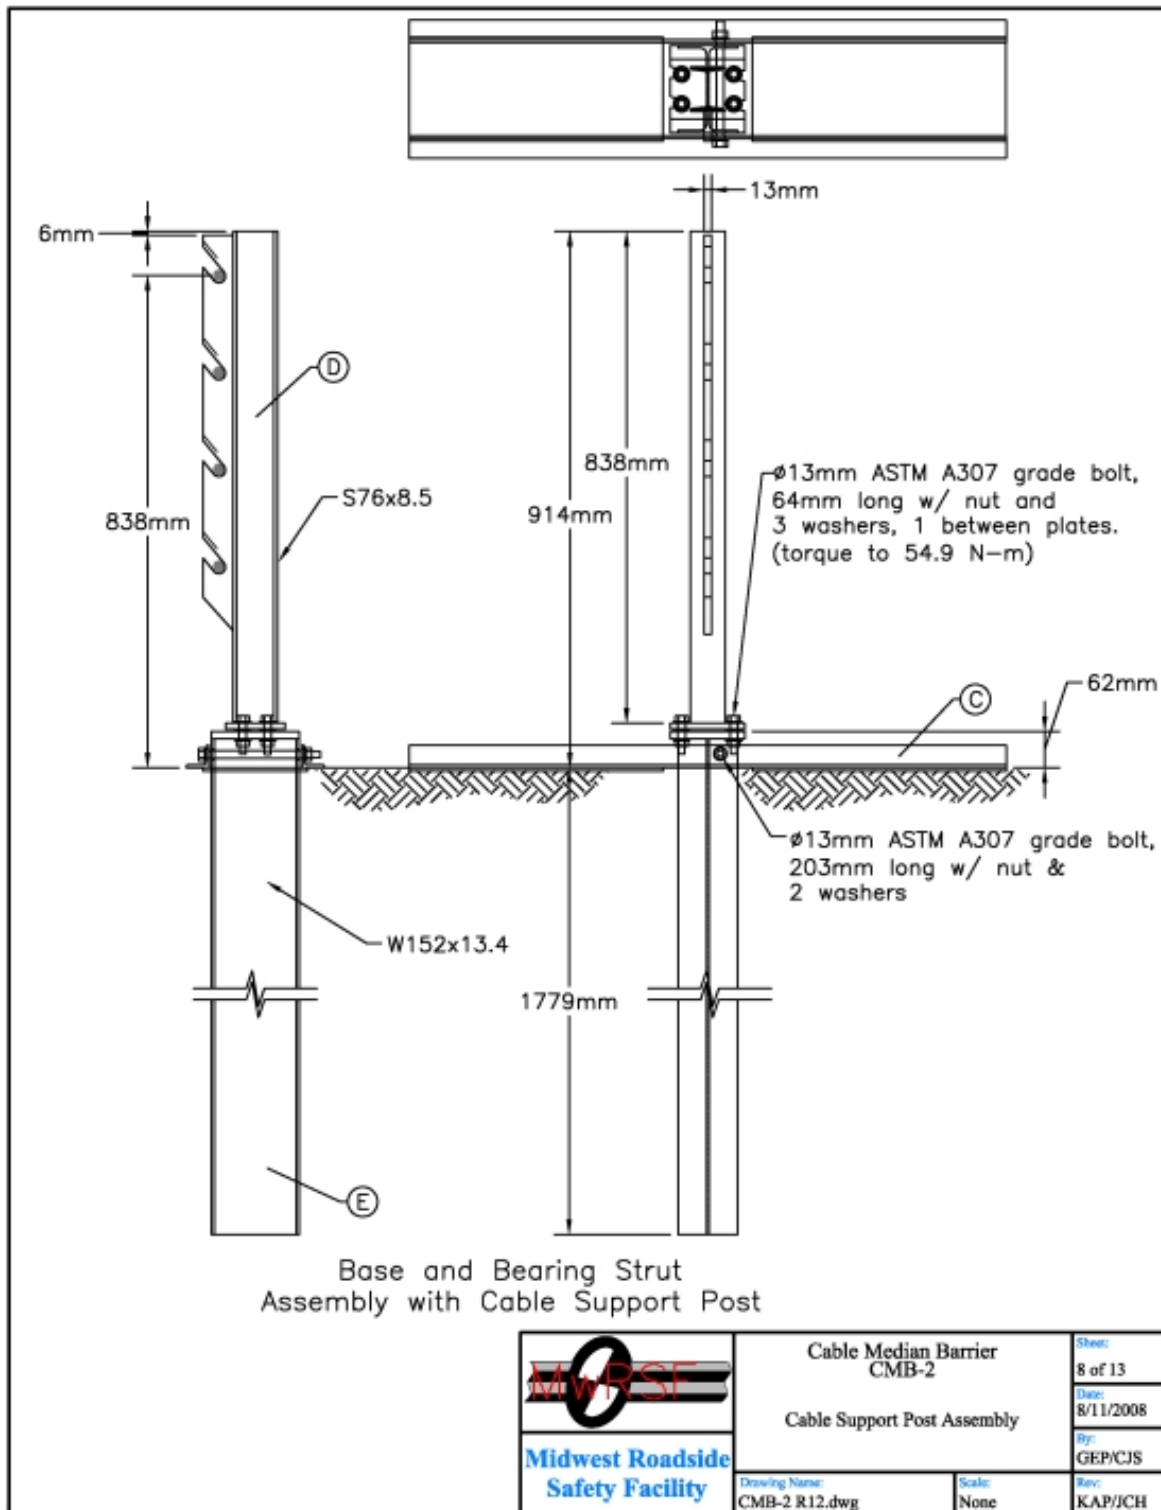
Cable Support Post Assembly (Metric), Design No. 2
